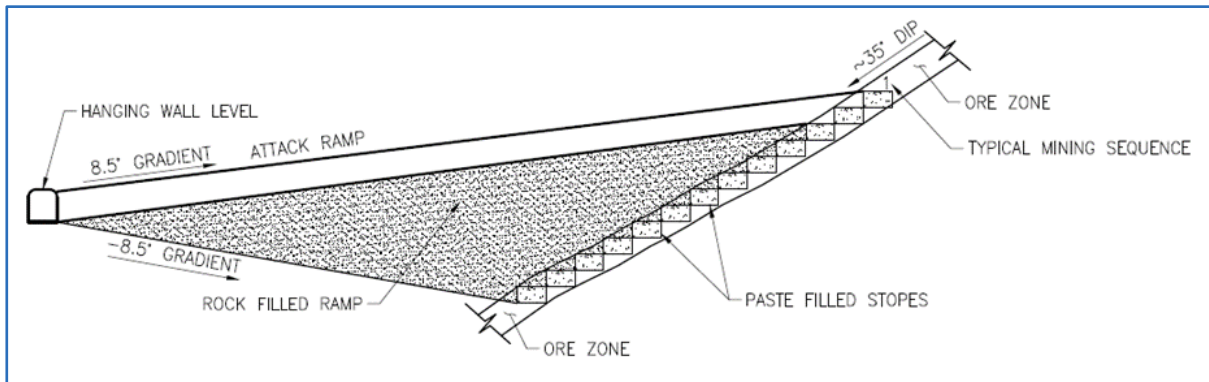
Section View of West Hanging Wall Accessed Drift-and-fill Area
